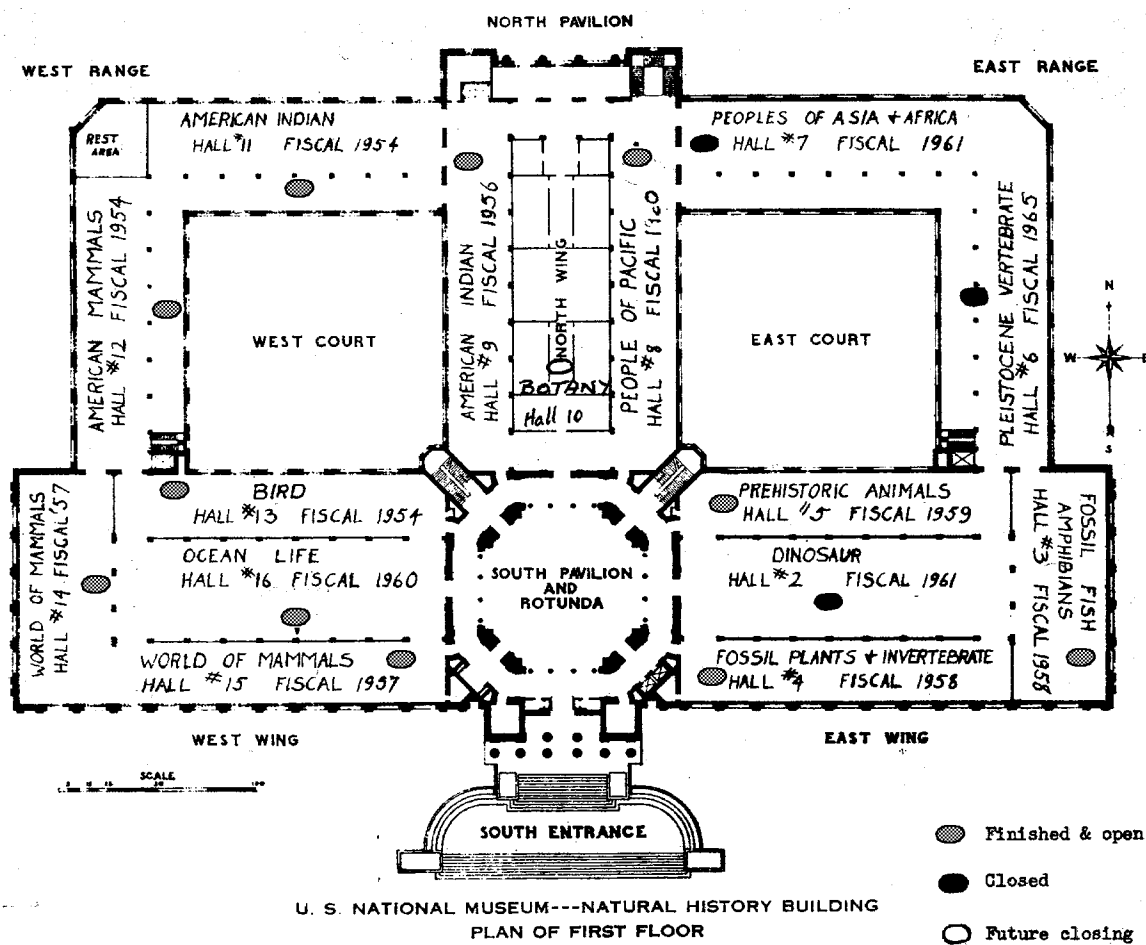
Floor plan of first floor of the Natural History Building, 1961. The botany hall has been moved to Hall 10 (center above Rotunda). SIA RU 155, Box 10 courtesy the Smithsonian Institution.
